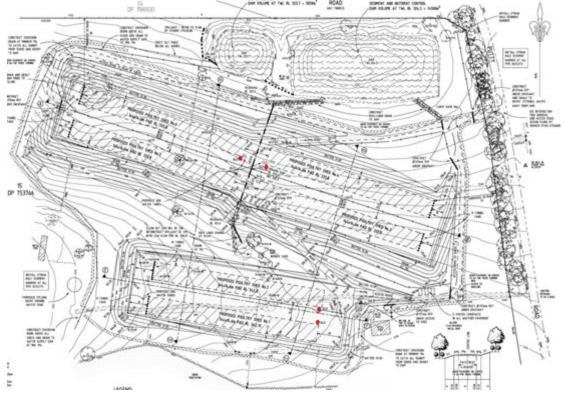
Part site plan showing location of feed storage silos (circled and marked in red) that do not comply with maximum building height requirement.
